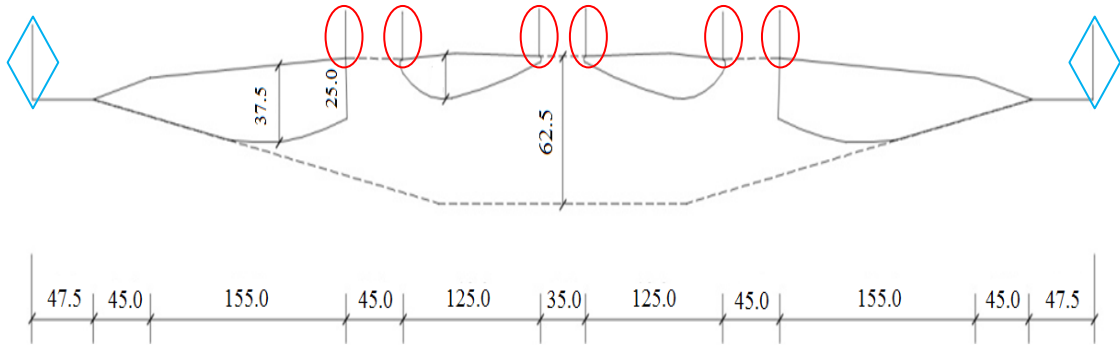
Cross-section of the Megane Bridge deck (unit: mm)
